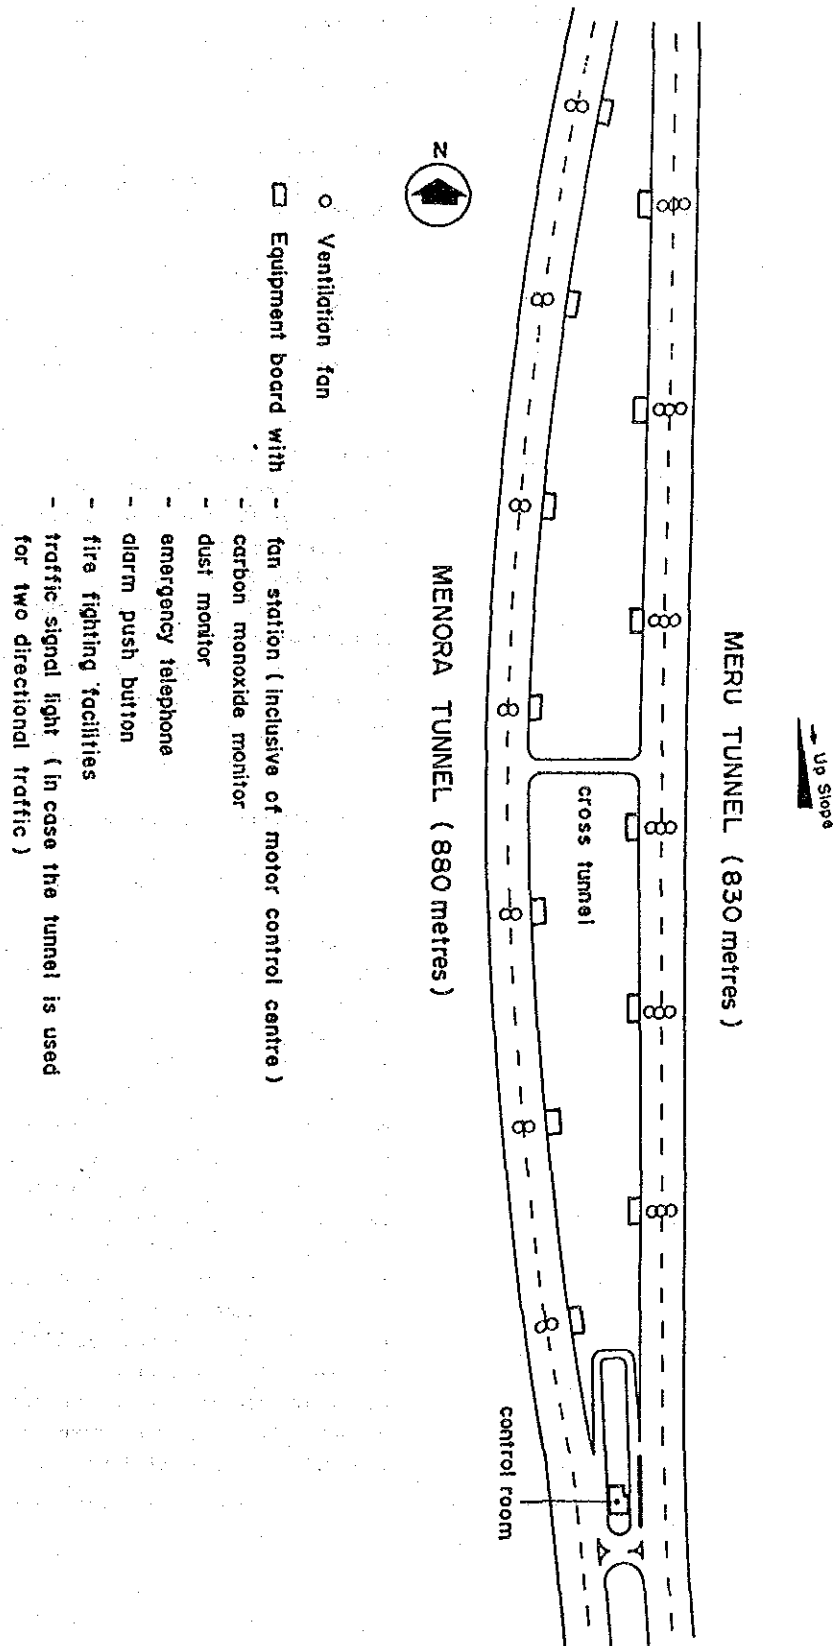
Layout of Equipment in Meru-Menora Tunnel
